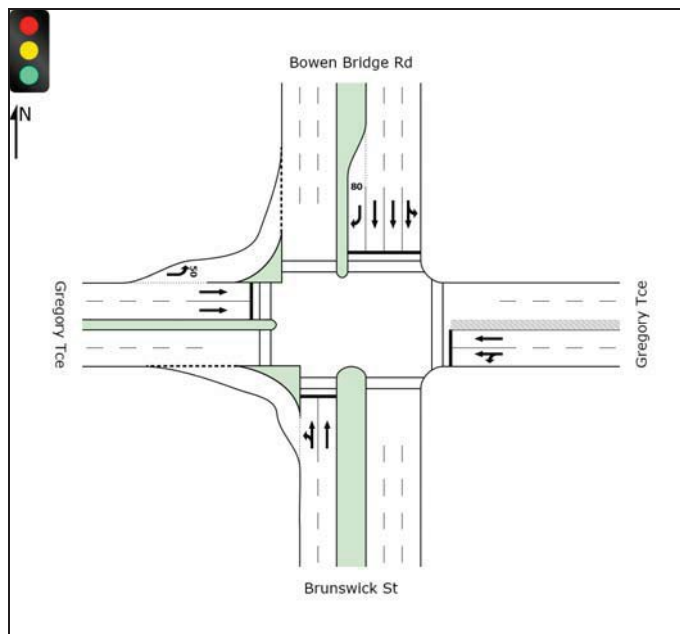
Bowen Bridge Road/Gregory Terrace/Brunswick Street
